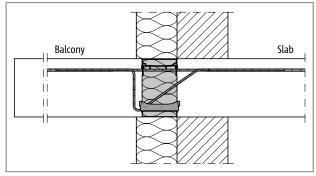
Schöck Isokorb® XT type K: Connection with thermal insulation composite system (WDVS)
